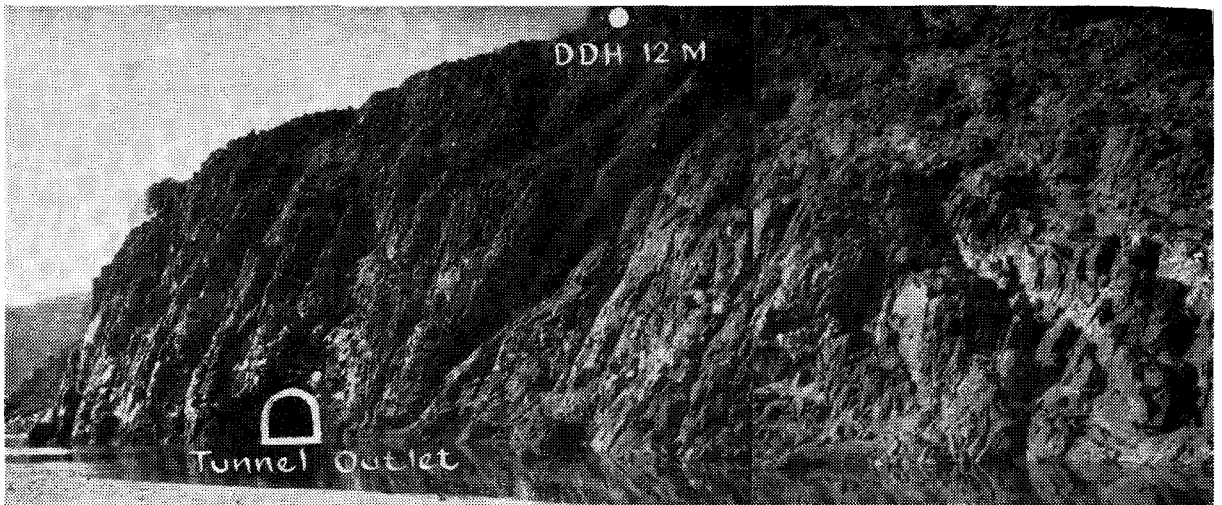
East Abutment—Looking North showing strong jointing—Tunnel outlet and site of DDH 12M.
